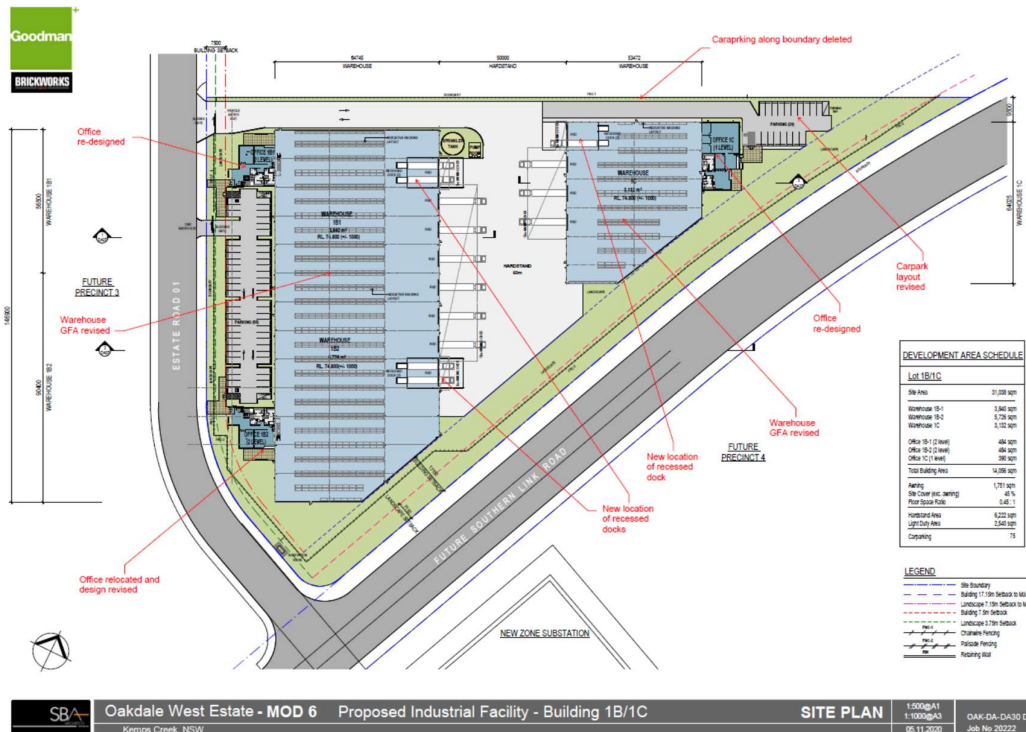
Stage 1 DA layout changes (Source: SBA Architects)
